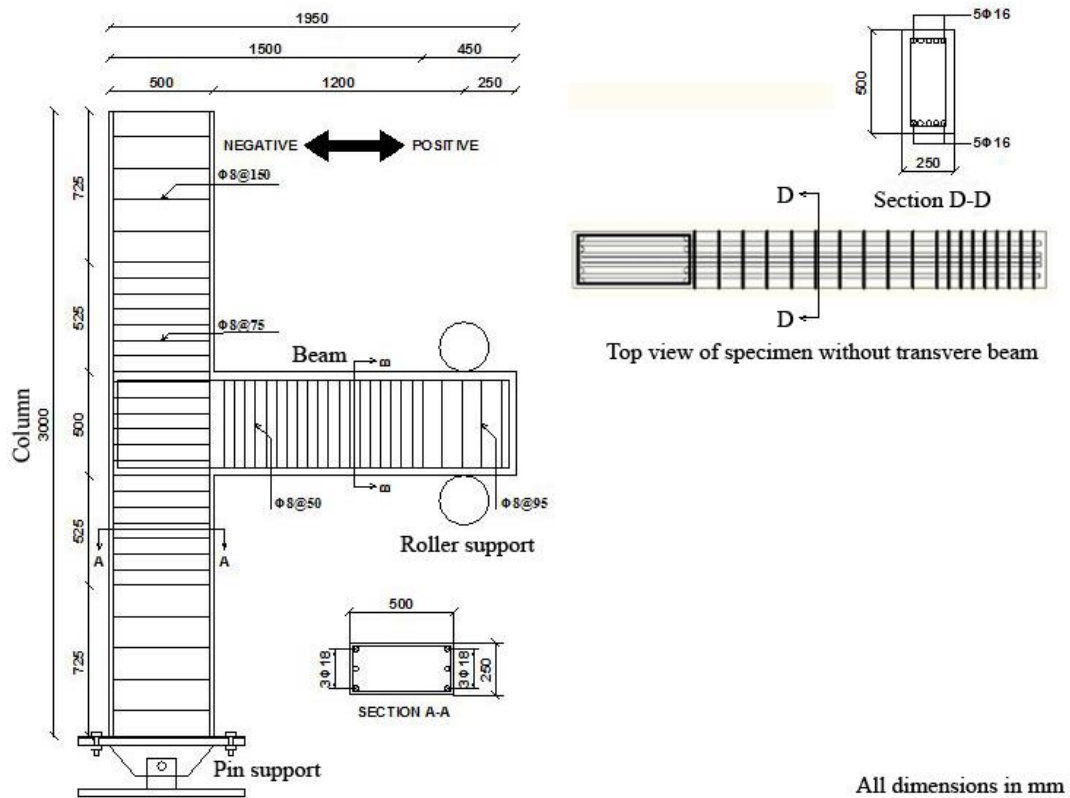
Dimensions and reinforcement details of the specimen of group 1
